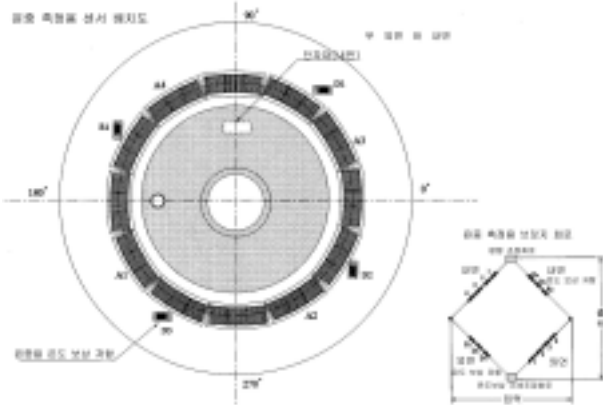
Arrangement Drawing of Sensor for Measure the Wheel Load
